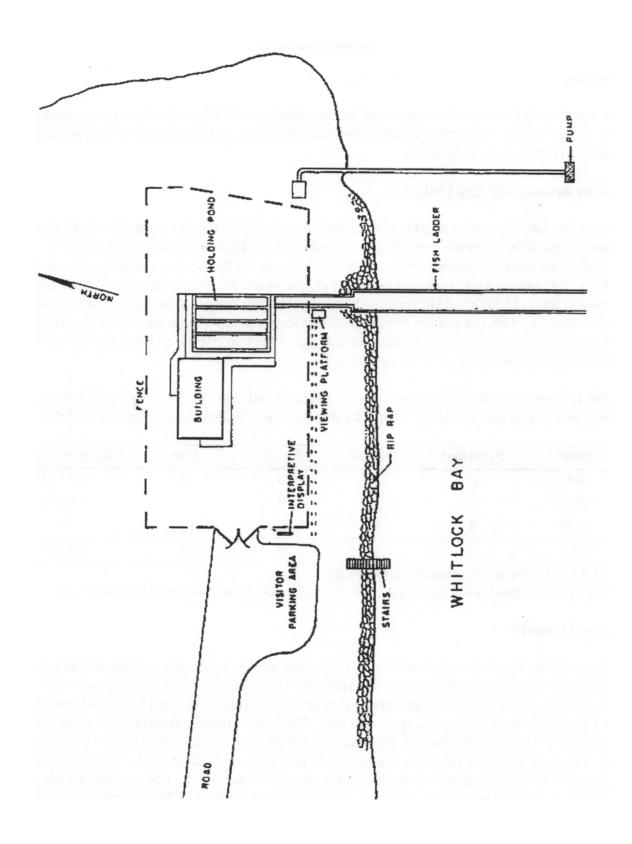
General layout of Whitlocks Bay Spawning Station 3
